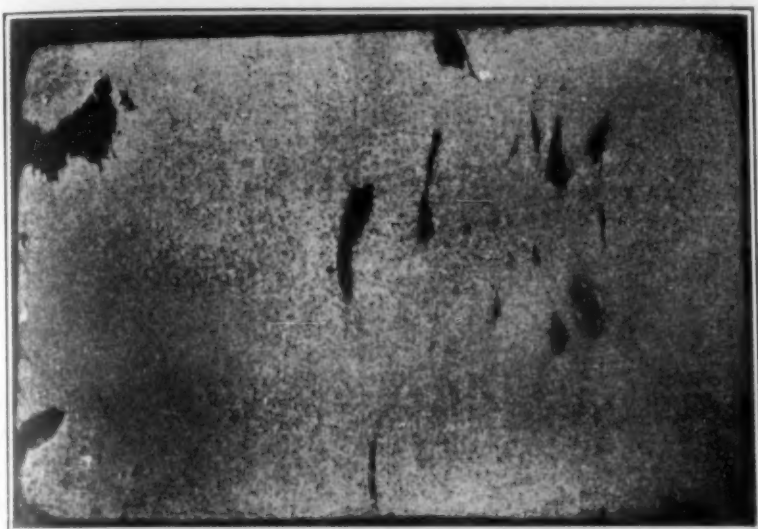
Position and Depth of Cracks Perpendicular to the Slab Surface
